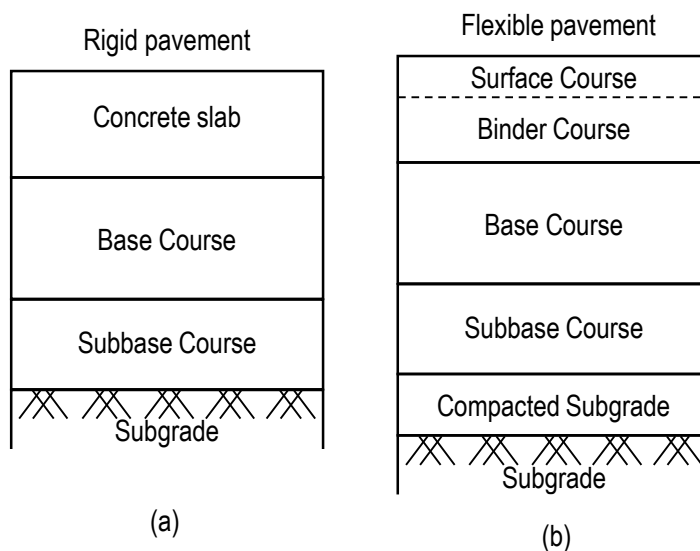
Typical cross section of (a) rigid pavement and (b) flexible pavement (adapted from Huang (1993))
